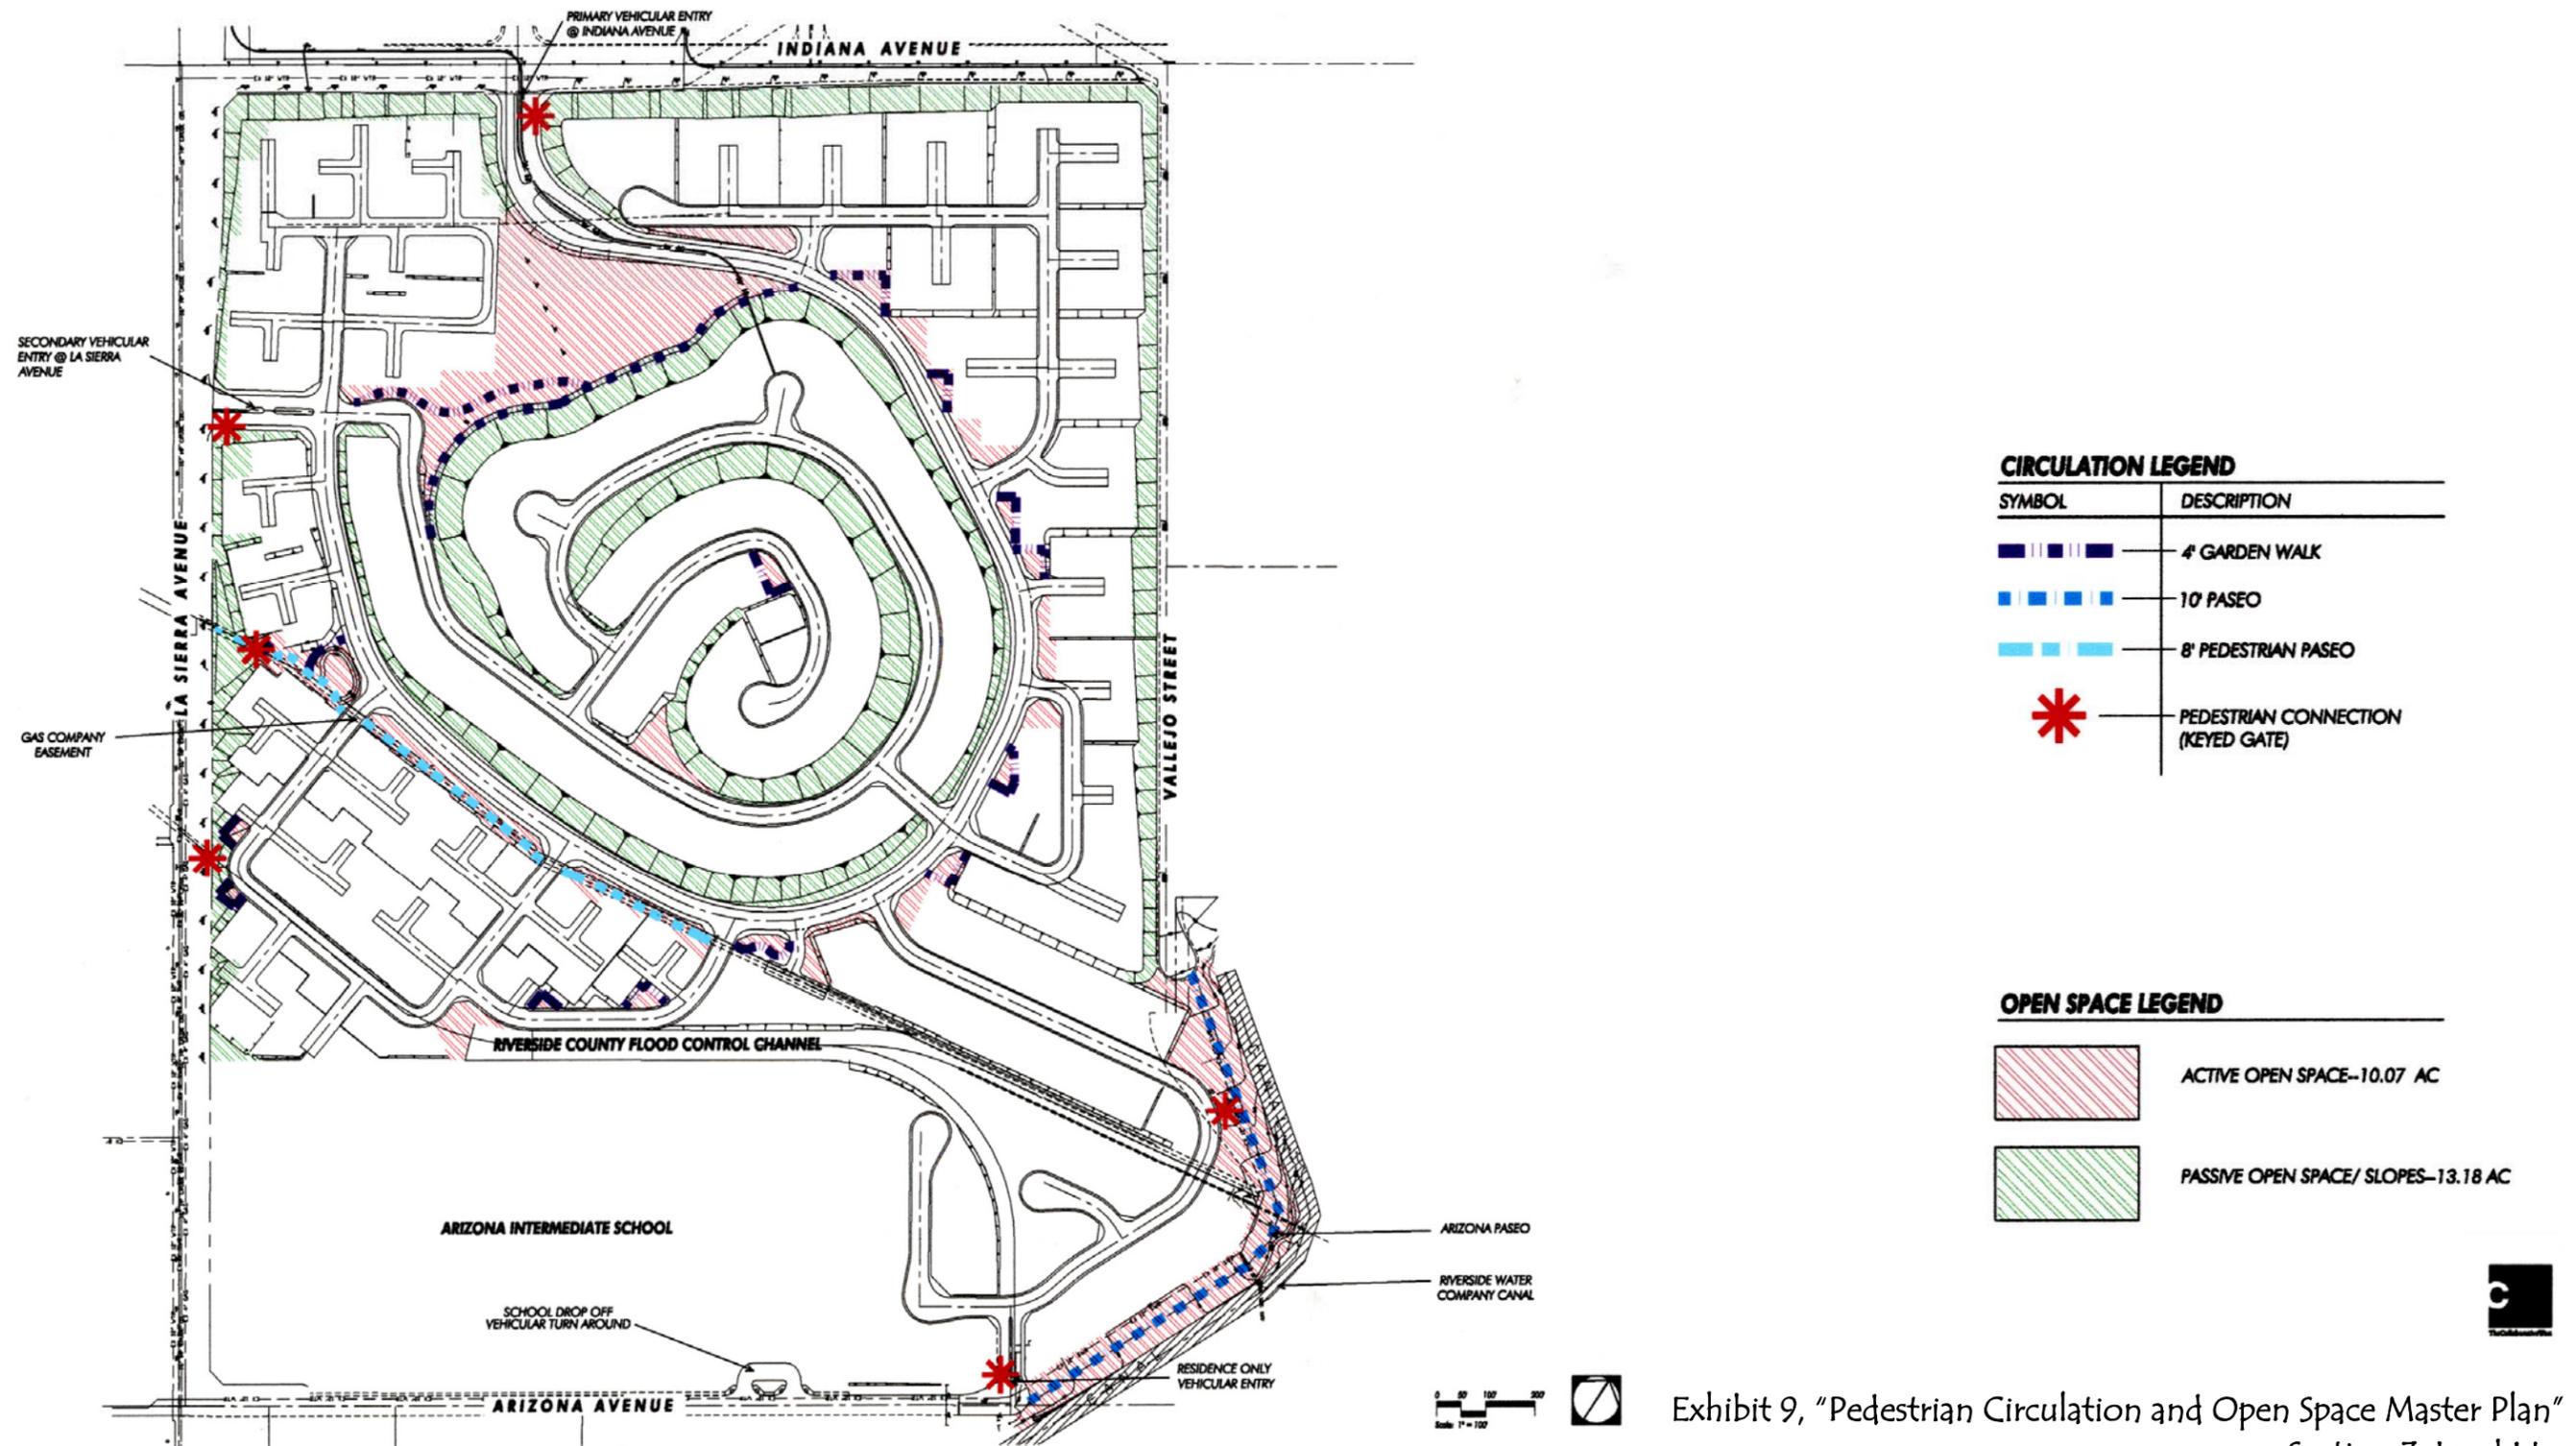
, "Pedestrian Circulation and Open Space Master Plan" Section 3. Land Use
